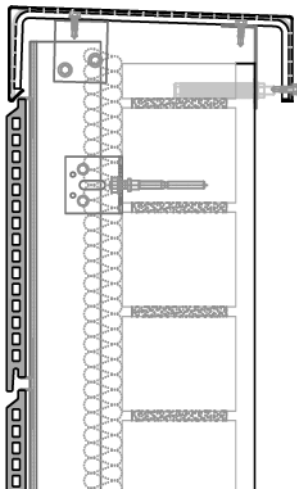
Horizontal section. Faveton® SAH Ceram 28.
